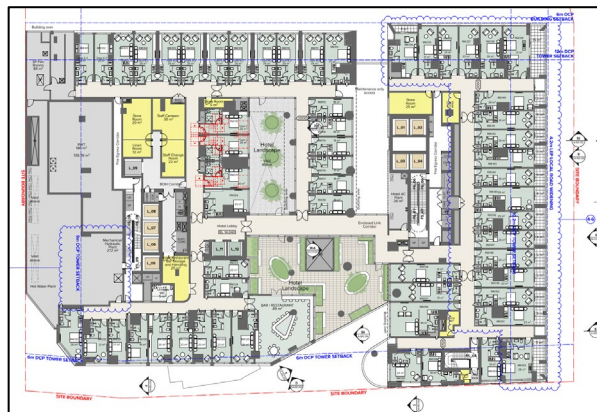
Proposed first floor - hotel uses (Source: Turner Architects)
